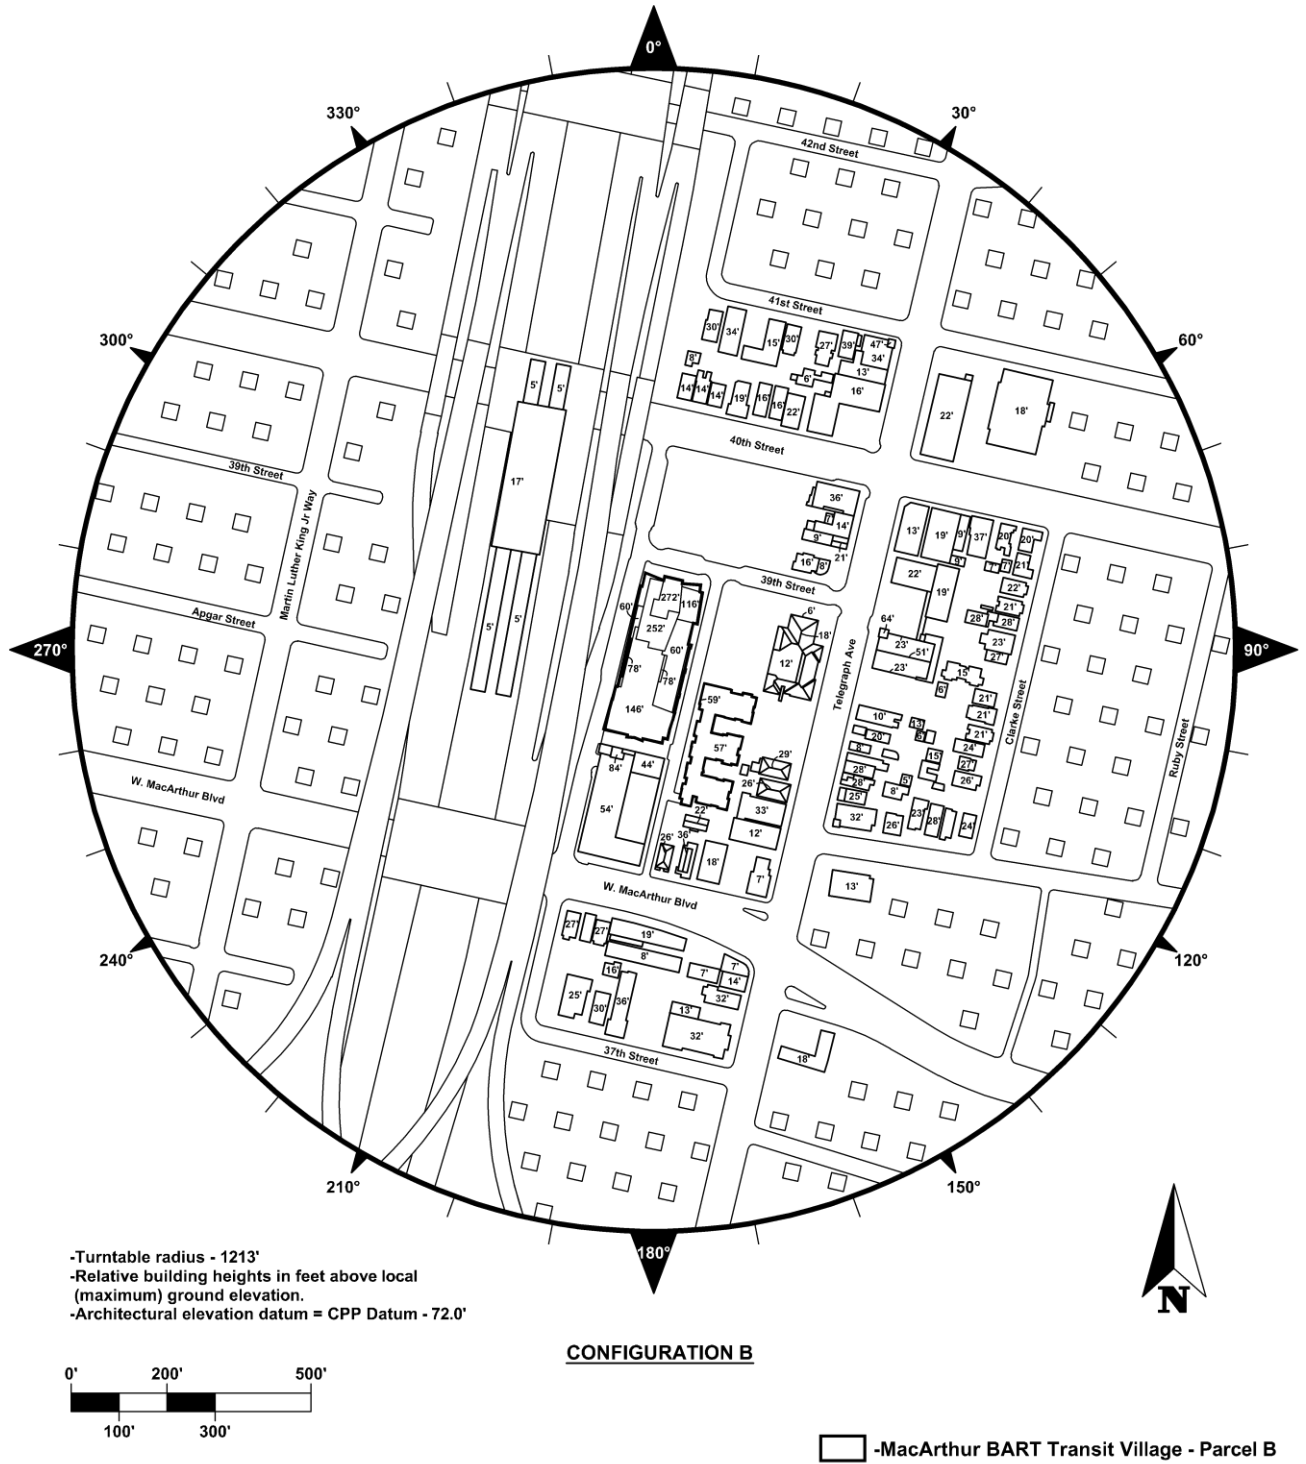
Plan view of turntable – Configuration B (Existing-plus-Proposed).
